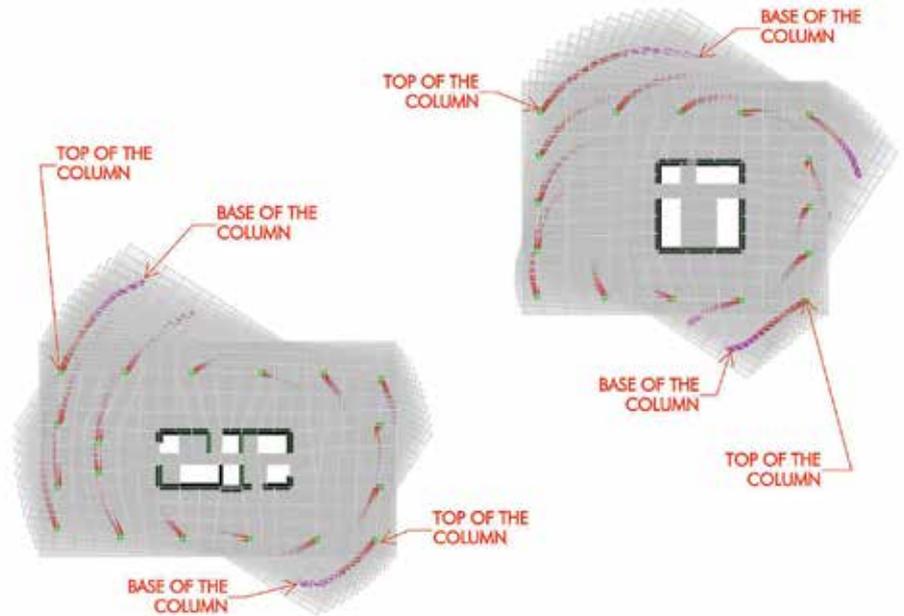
Sloping Columns (Source: DeSimone Consulting Engineers, PLLC)
